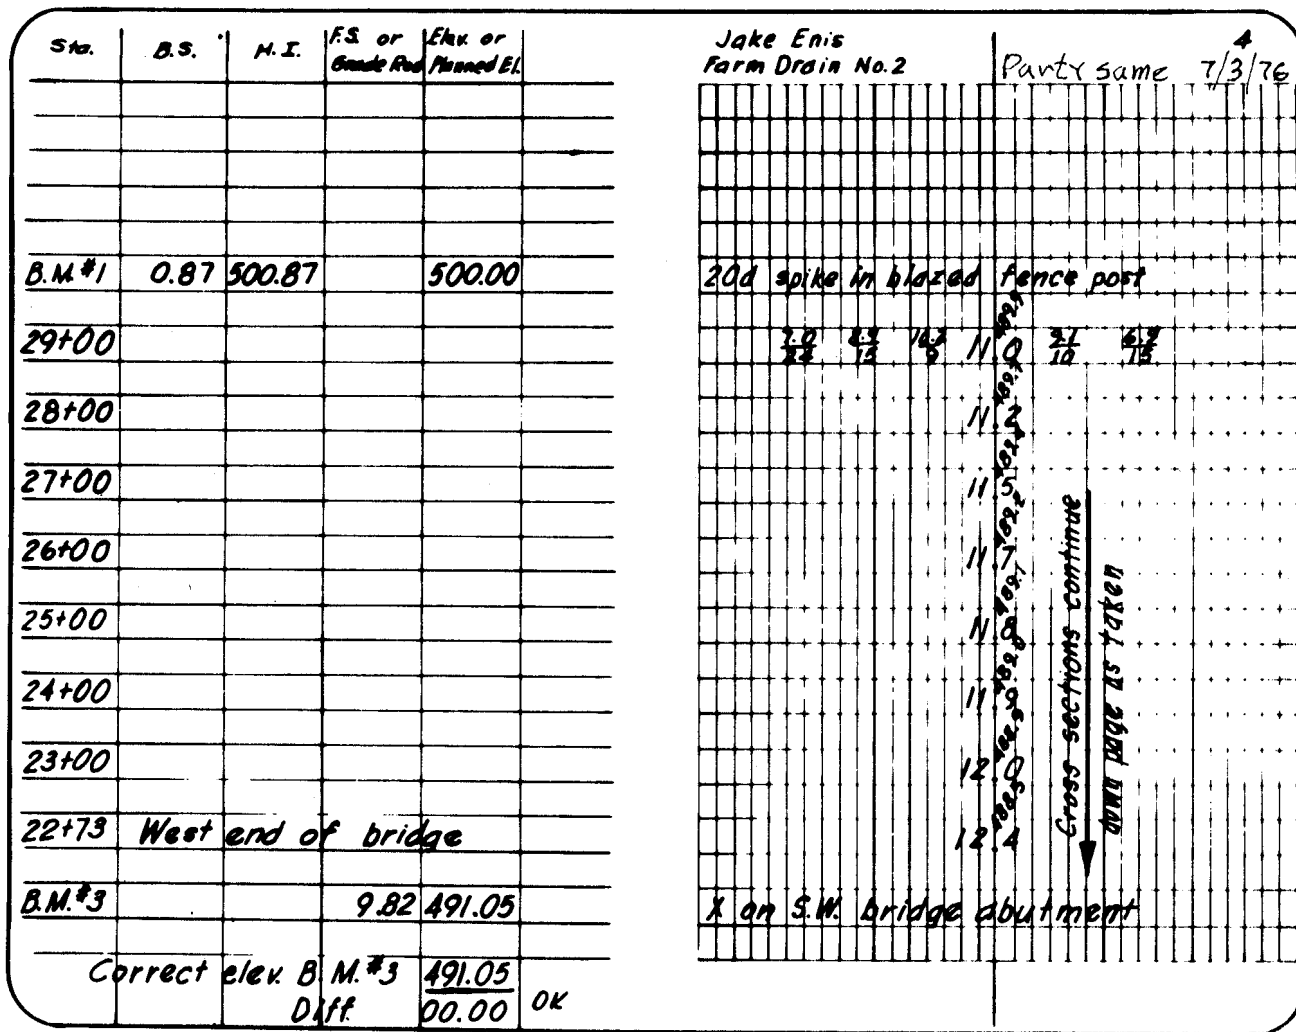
(a).—Survey notes—profile and cross section (English)—continued.
